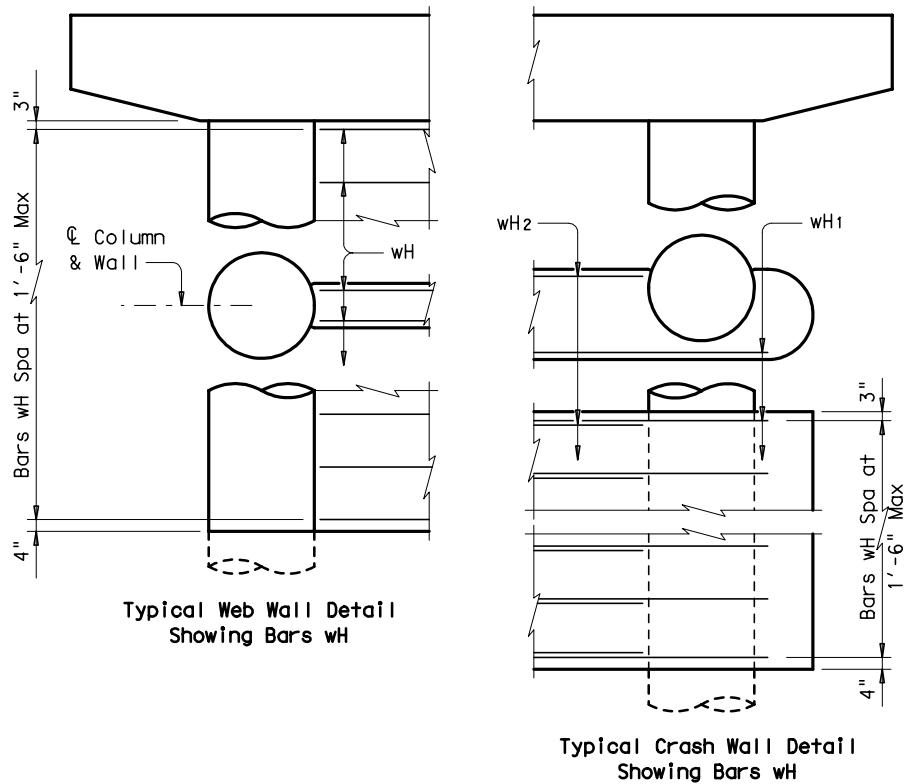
Bars wH Details. Online users can click 4-24 to view this illustration in PDF.
